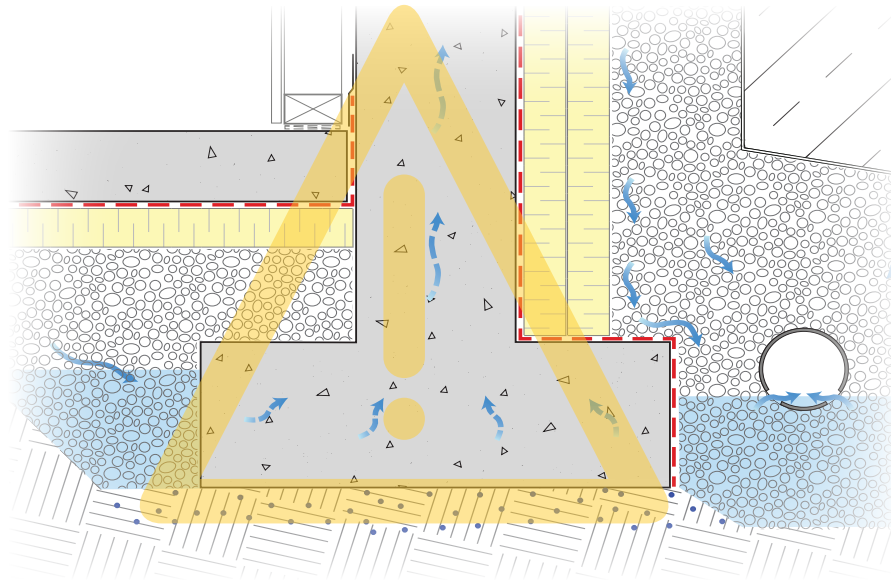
Typical footing and foundation wall poured without a capillary break can be at risk of 'rising damp' within the foundation wall.
